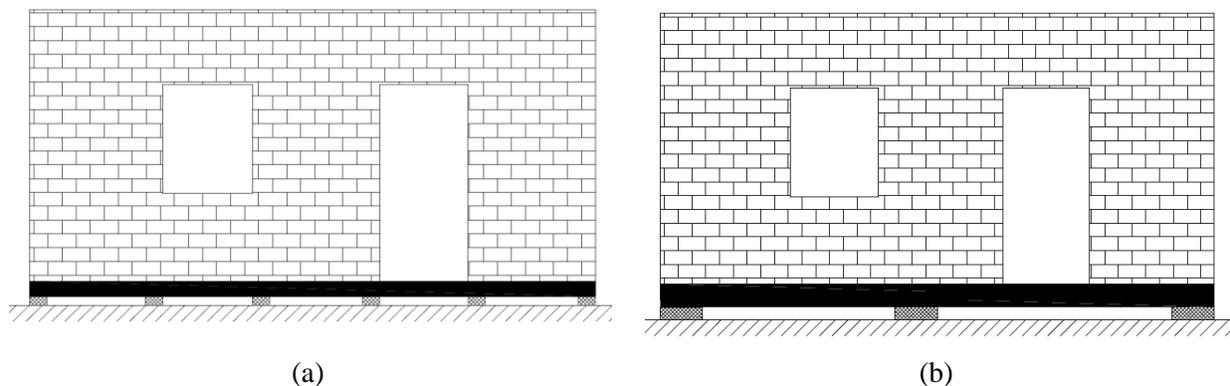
(a) Each masonry wall has at least two bearing, (b) isolator devices are at the wall crossings
